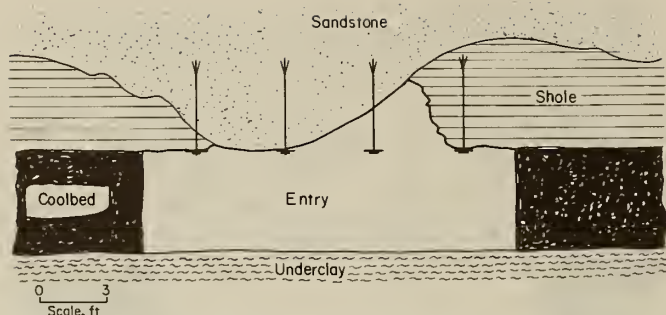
Subtype G_4 roof failure attributed to paleochannel (roof roll).
